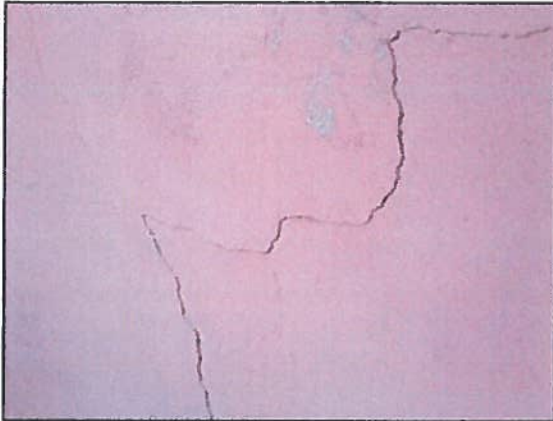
Roy Noon Meeting Hall – Cracking within stucco over old chimney
